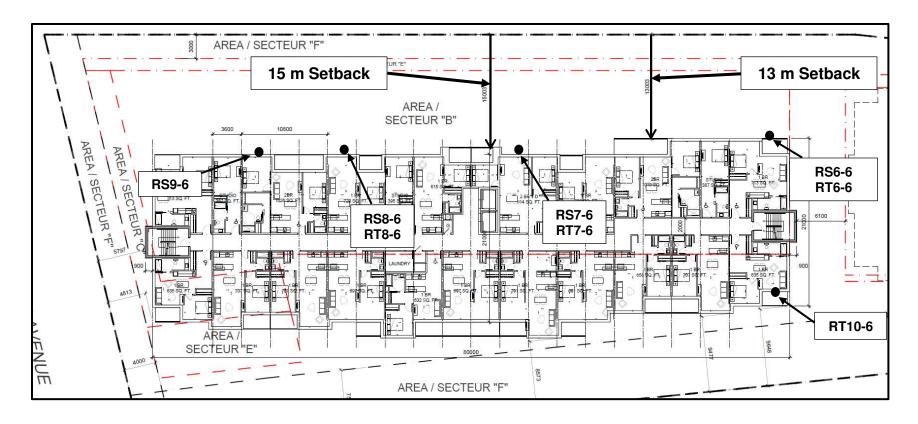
Ground Floor Plan, 175 Richmond Road, 9-storey Building
